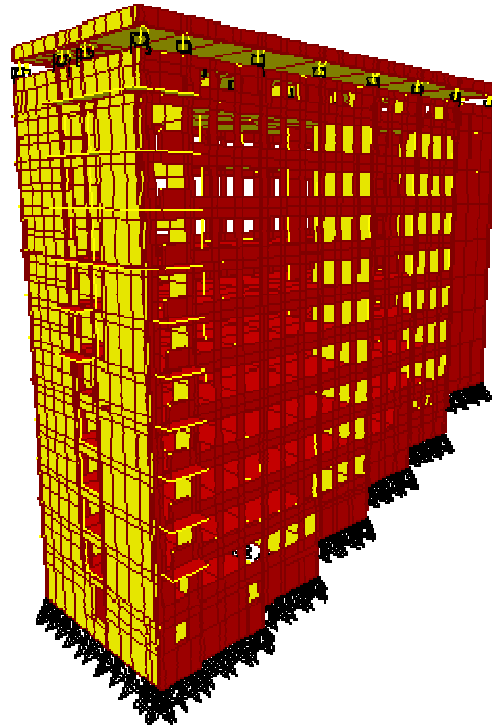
Design model of the 12-story office building with R/C bearing frames and shear walls protected by an isolated upper slab
